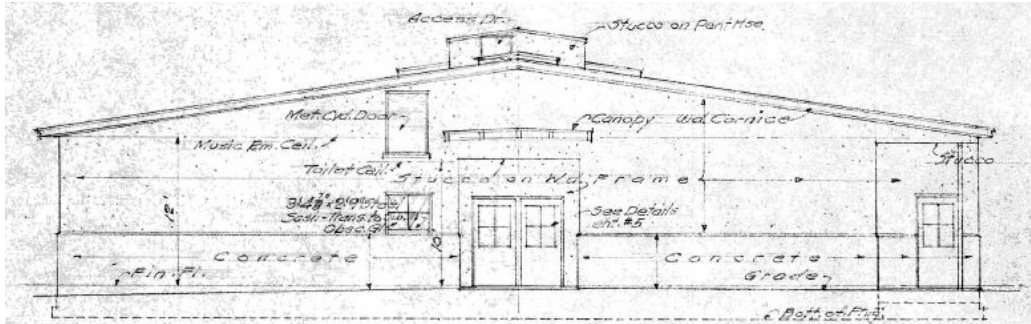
South façade of Cafeteria building as designed in 1949. Source: OUSD.
